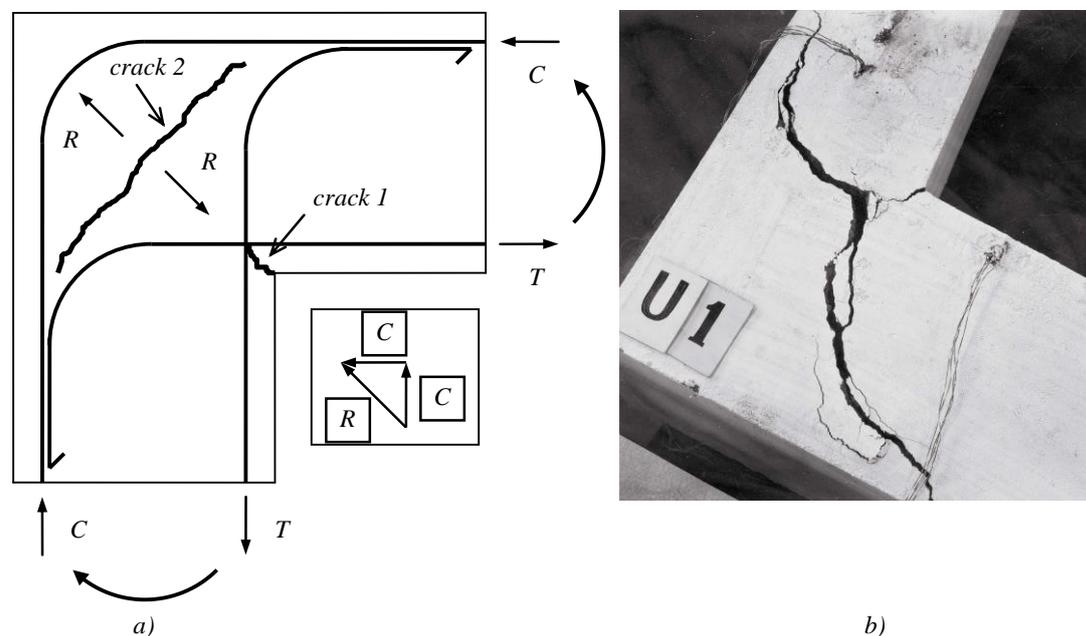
Detail Type 1, a) used in earlier practice which is not very successful, b) shows the typical crack pattern. The figure a) is taken from Johansson (2000). Photo is from Nilsson (1973).
